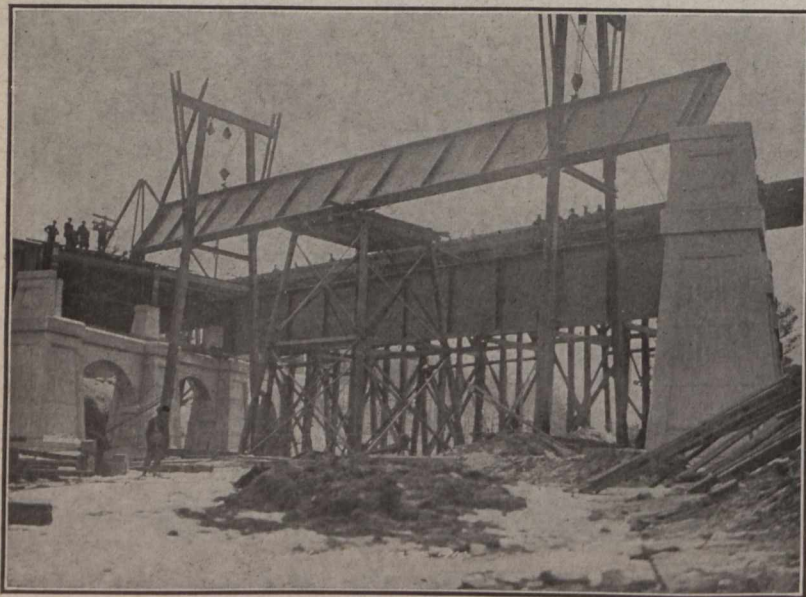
Erection of One of the Inner Hundred-foot Plate Girders.
